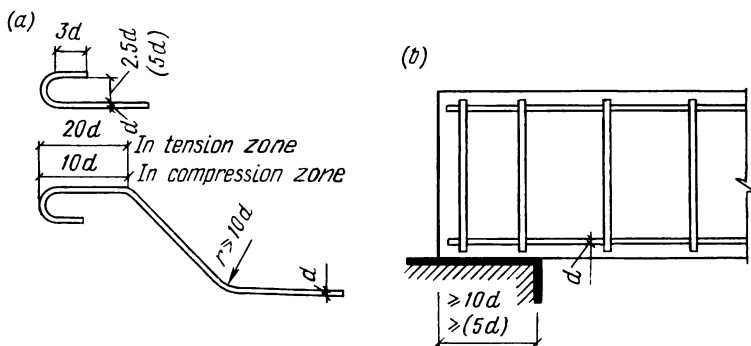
Anchorage of nonprestressed reinforcing steel
